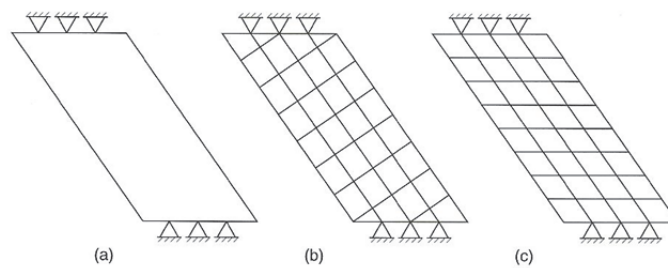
Grillage Mesh for Long and Narrow Bridge Decks with Large Skew (a) Plan View, (b) Grillage Layout, (c) Alternative Grillage Layout (O'Brien & Keogh, 1999) Used under fair use, 2013
